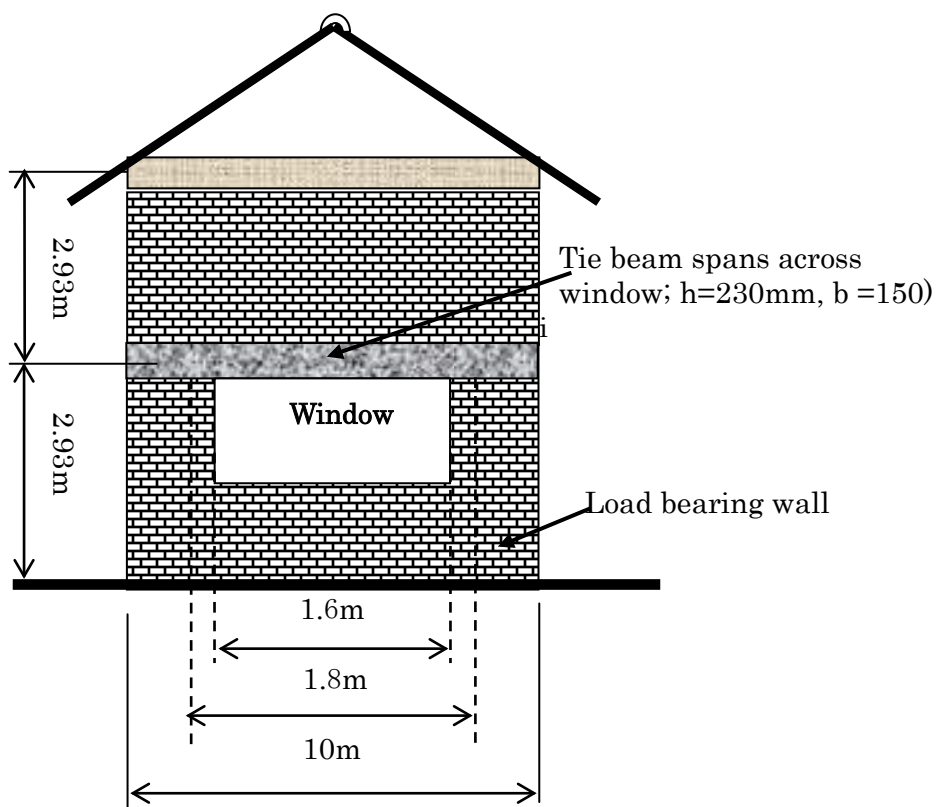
Idealized geometry showing target designed tie beam (floor span 4m)
